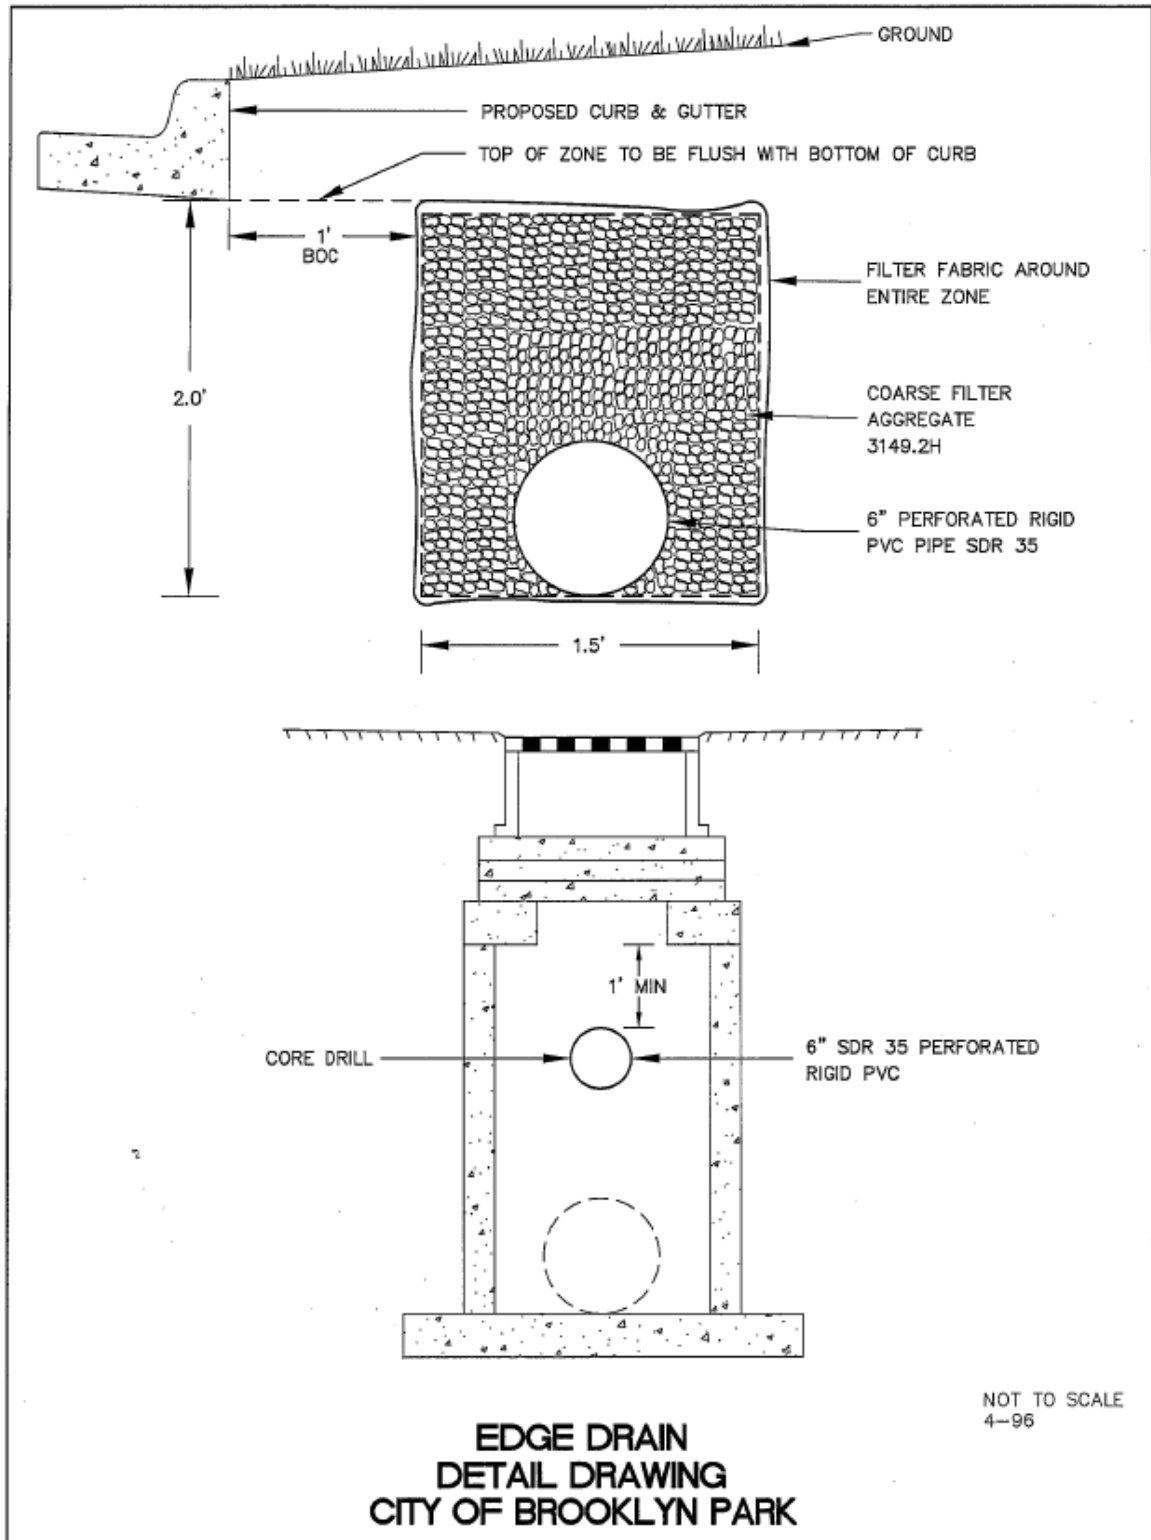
Cross-section of edgedrain (Mn/DOT, 1994b).
